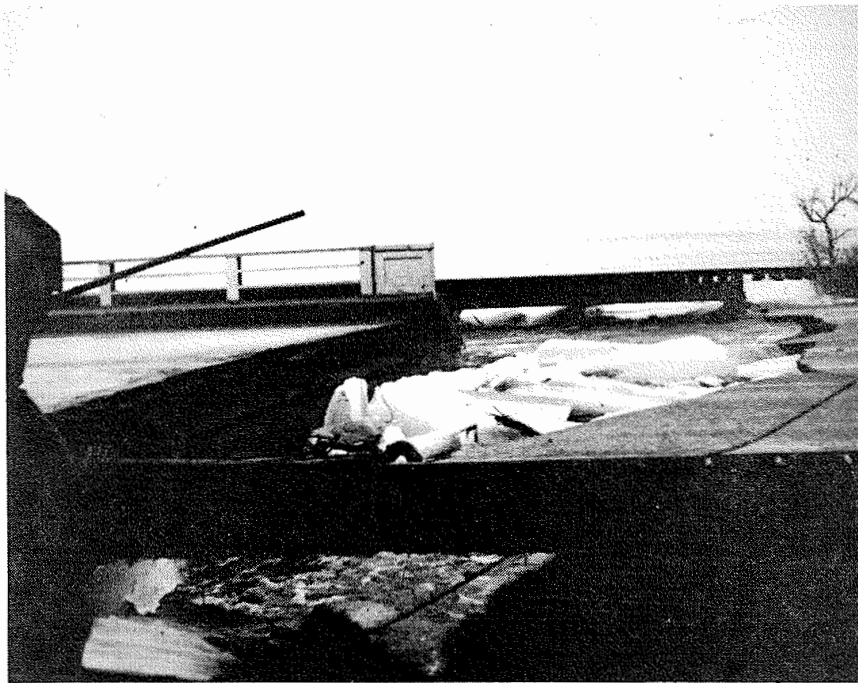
Photograph showing erosion on the east side of Highway 20 Bridge on the inlet-outlet channel (April 10, 1969).
